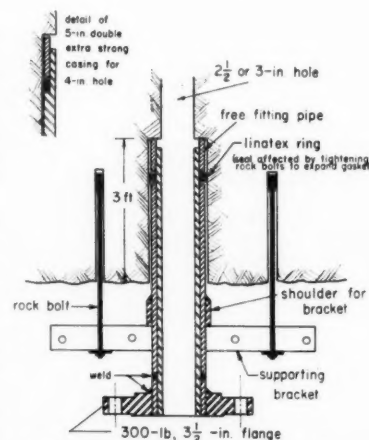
Detailed view of up casing used for making connections to pulp carrying bore hole. (See figure 4.)
